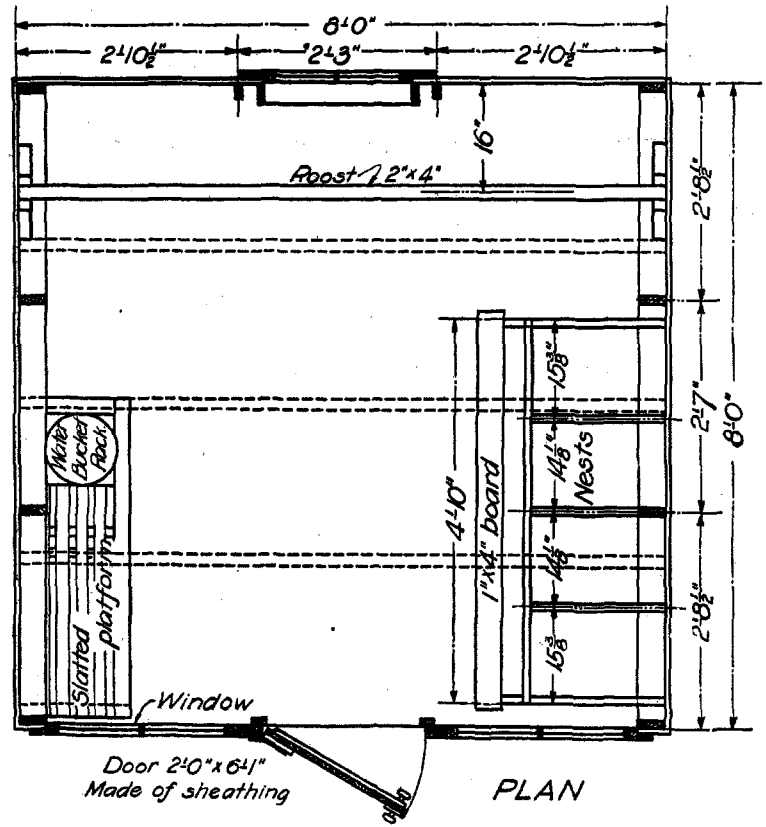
Floor plan of house shown in fig. 10 when used for laying hens.
